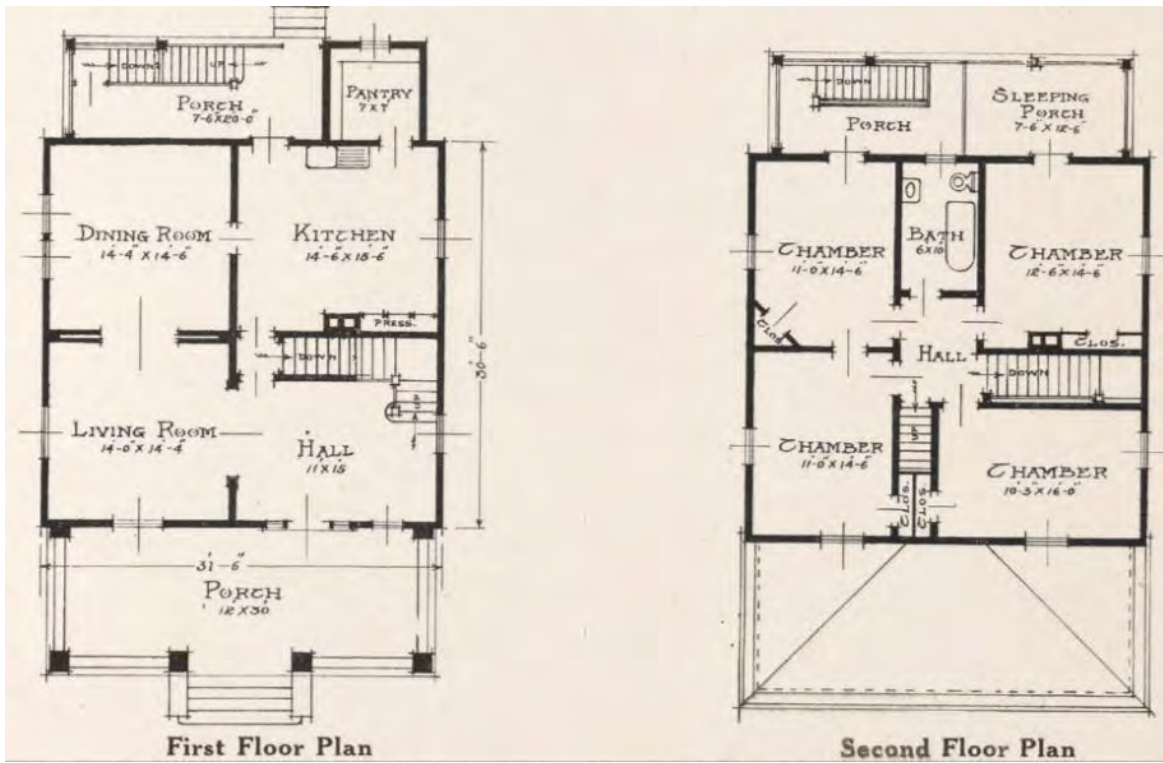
Example of square plan house layout (Montgomery 2018:51).
